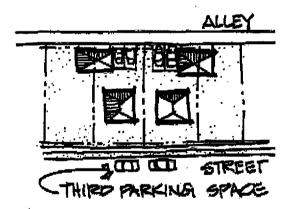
\H 459 3.210.03 P - 3rd Parking Space on Alley
